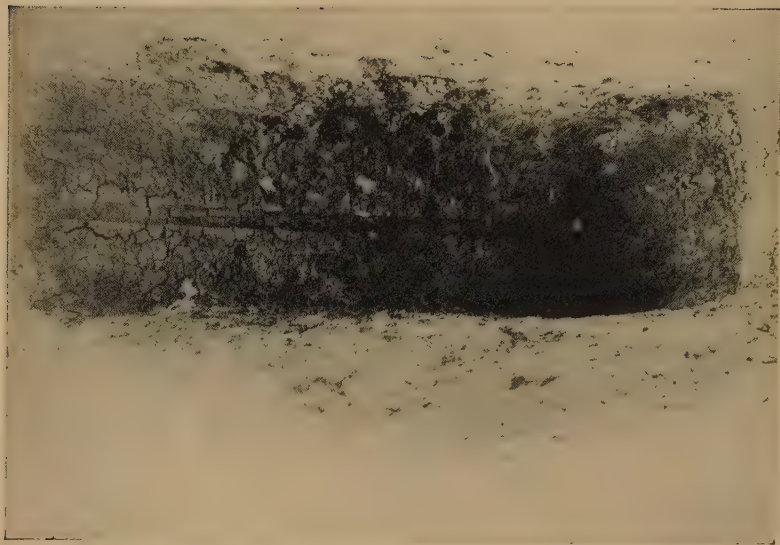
CAVITY FOR MALONE TYPE ANCHOR AS
